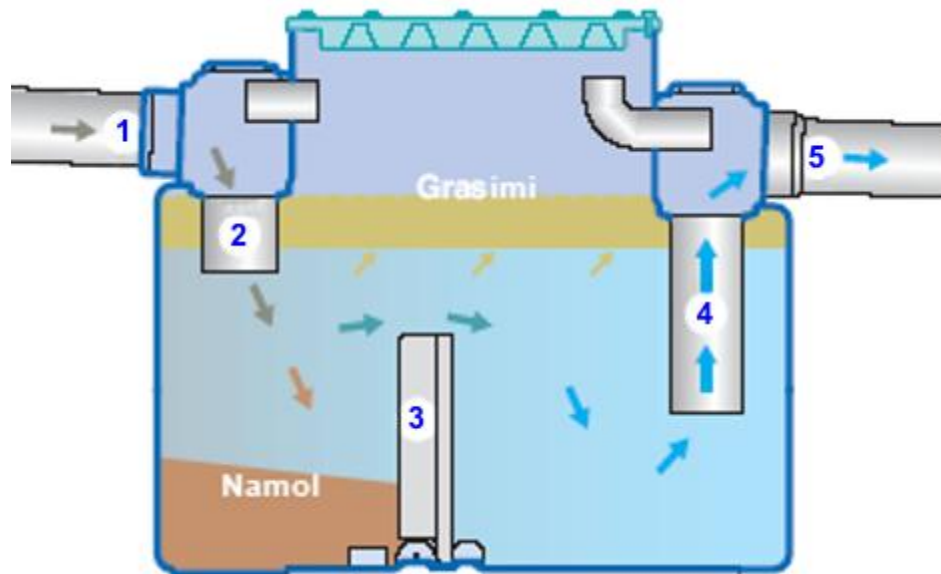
Oil and grease separator :1 – Inlet; 2 – Anti-splash nozzle; 3 – Dividing wall; 4 – Outlet siphon; 5 – Drainage
